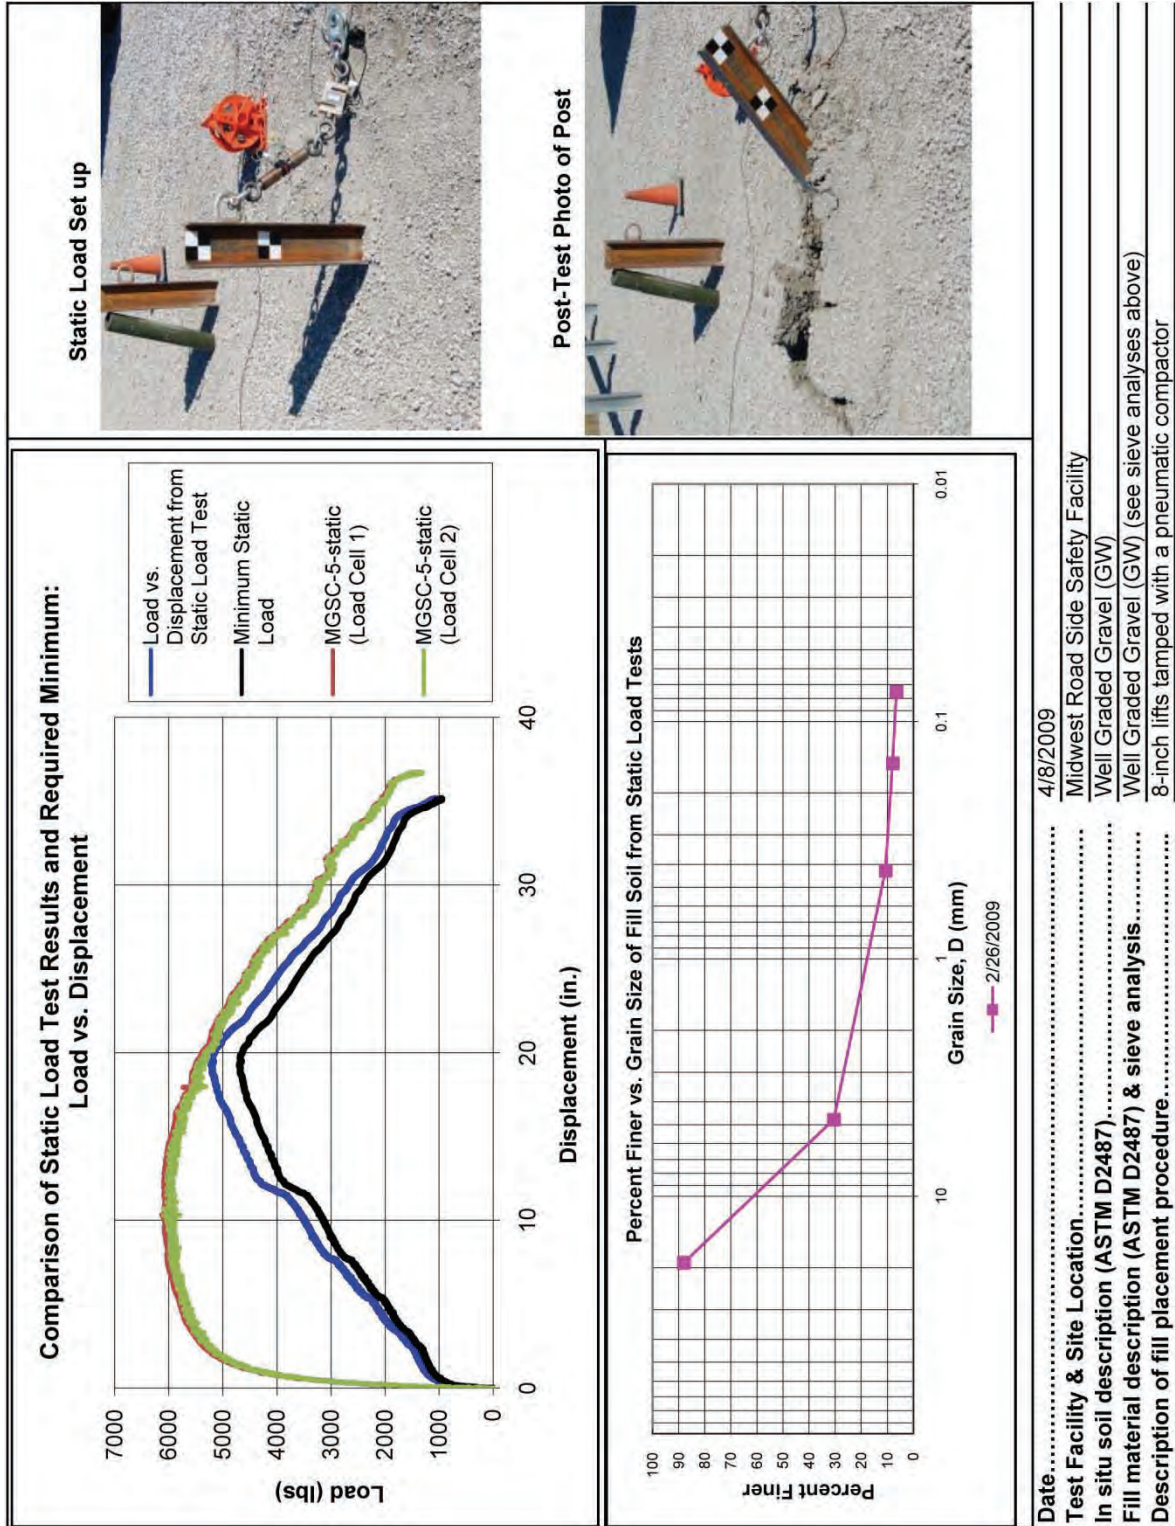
Static Soil Test, Test No. MGSC-5 Static
